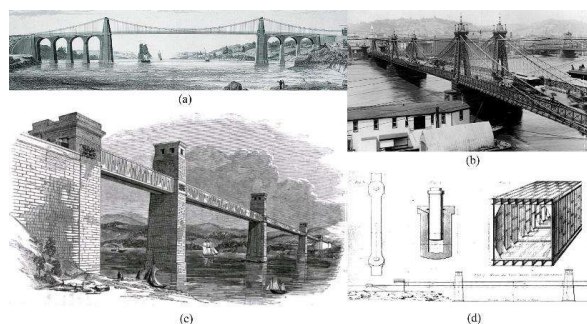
(a) Menai Bridge general view (b) Mononghaela Bridge (c) Britannia Bridge. England 1846 (d) The bridge tunnel over the Menai Street.
